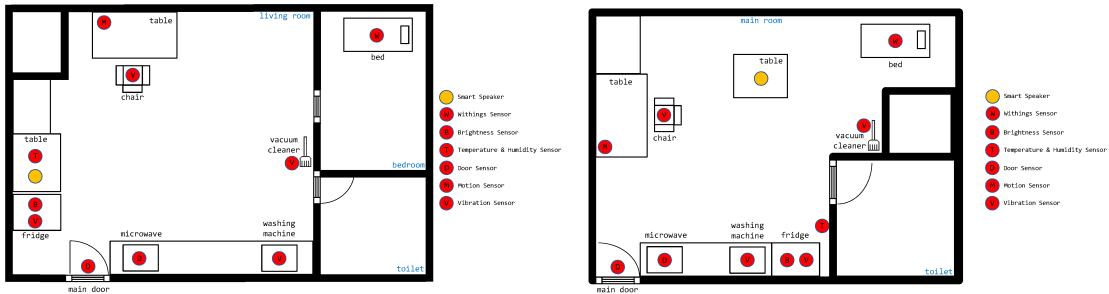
Examples of floor plans for sensor placements. (Left: One-bedroom apartment layout, Right: Studio apartment layout)
